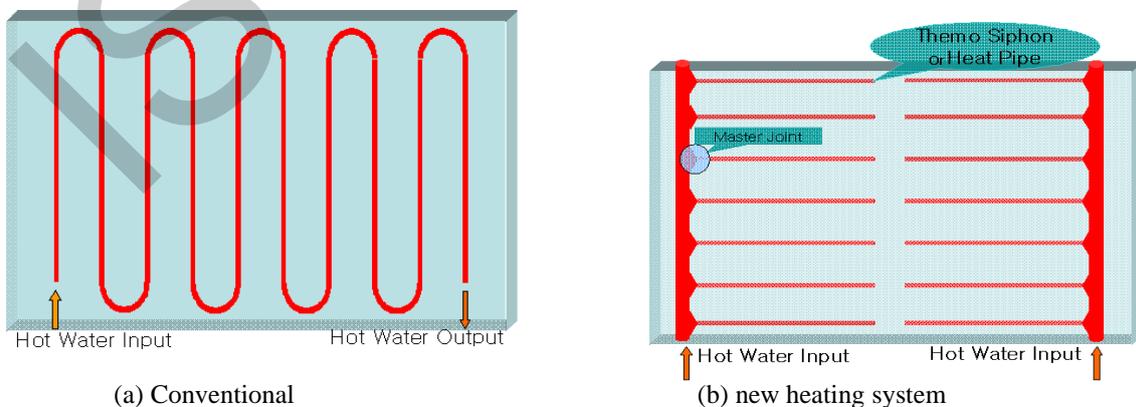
Conventional and new floor heating system with thermo siphon or heat pipe
